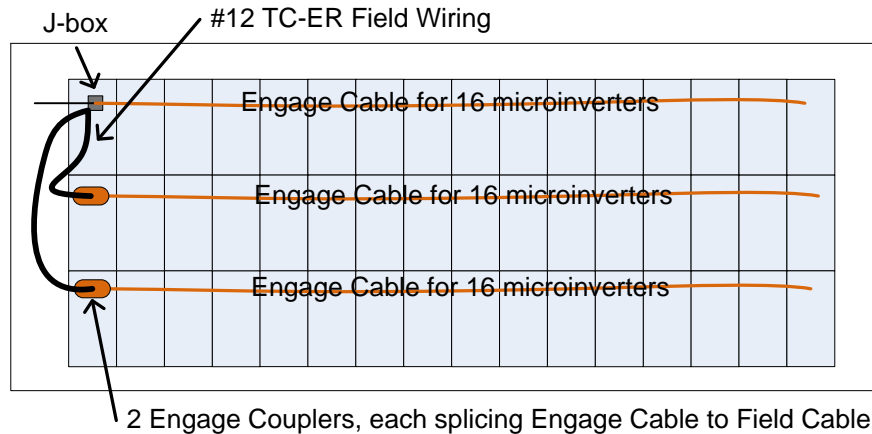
Engage Couplers are connecting Engage Cables to TC-ER field cables, providing an extension so that multiple circuits can be fed from a single junction box.
